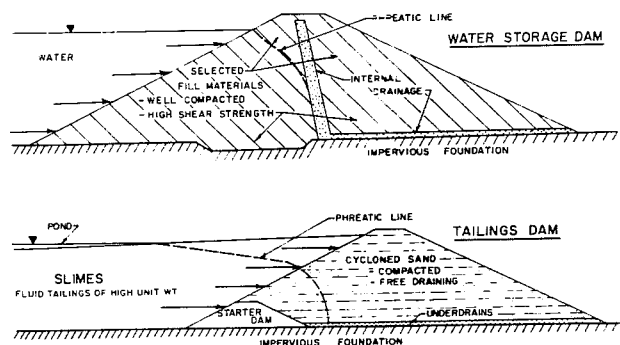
Comparison Between Typical Water Storage Dam and Tailings Dam Built Using One of the Downstream Methods of Construction
